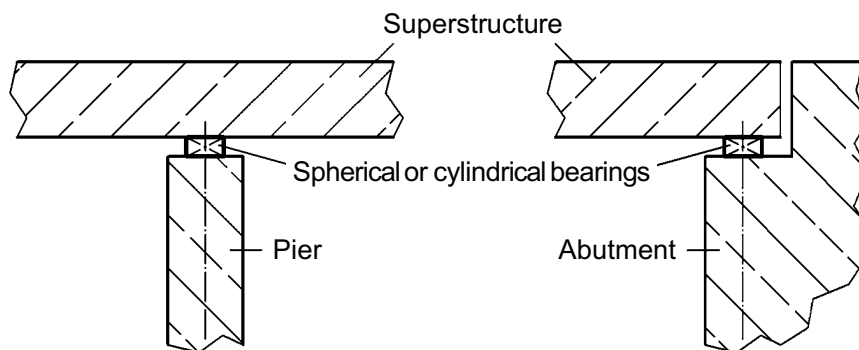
Assembly of a guided and free movable MAURER MSM® Spherical and Cylindrical Bearings and its intended use (example)
